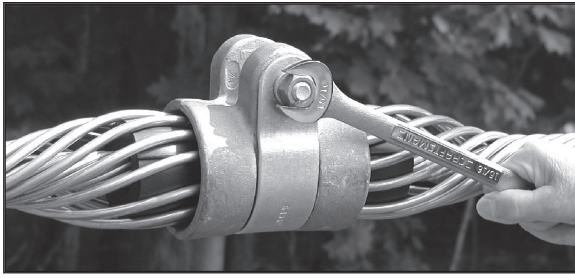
TIGHTEN NUT UNTIL LOCK WASHER FLATTENS
